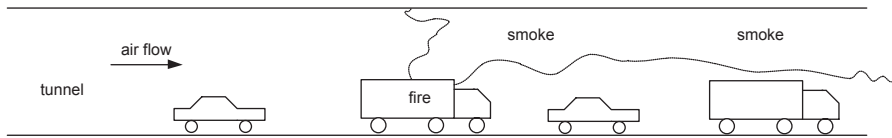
Fire ventilation in a tunnel with longitudinal ventilation
